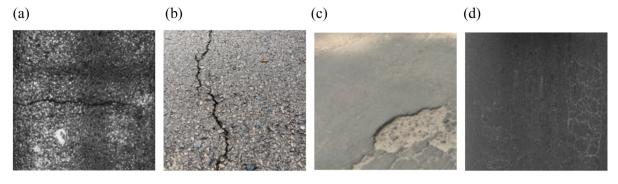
Pavement defect data. (a) Transverse cracks. (b) Longitudinal cracks. (c) Potholes. (d) Alligator cracks.
